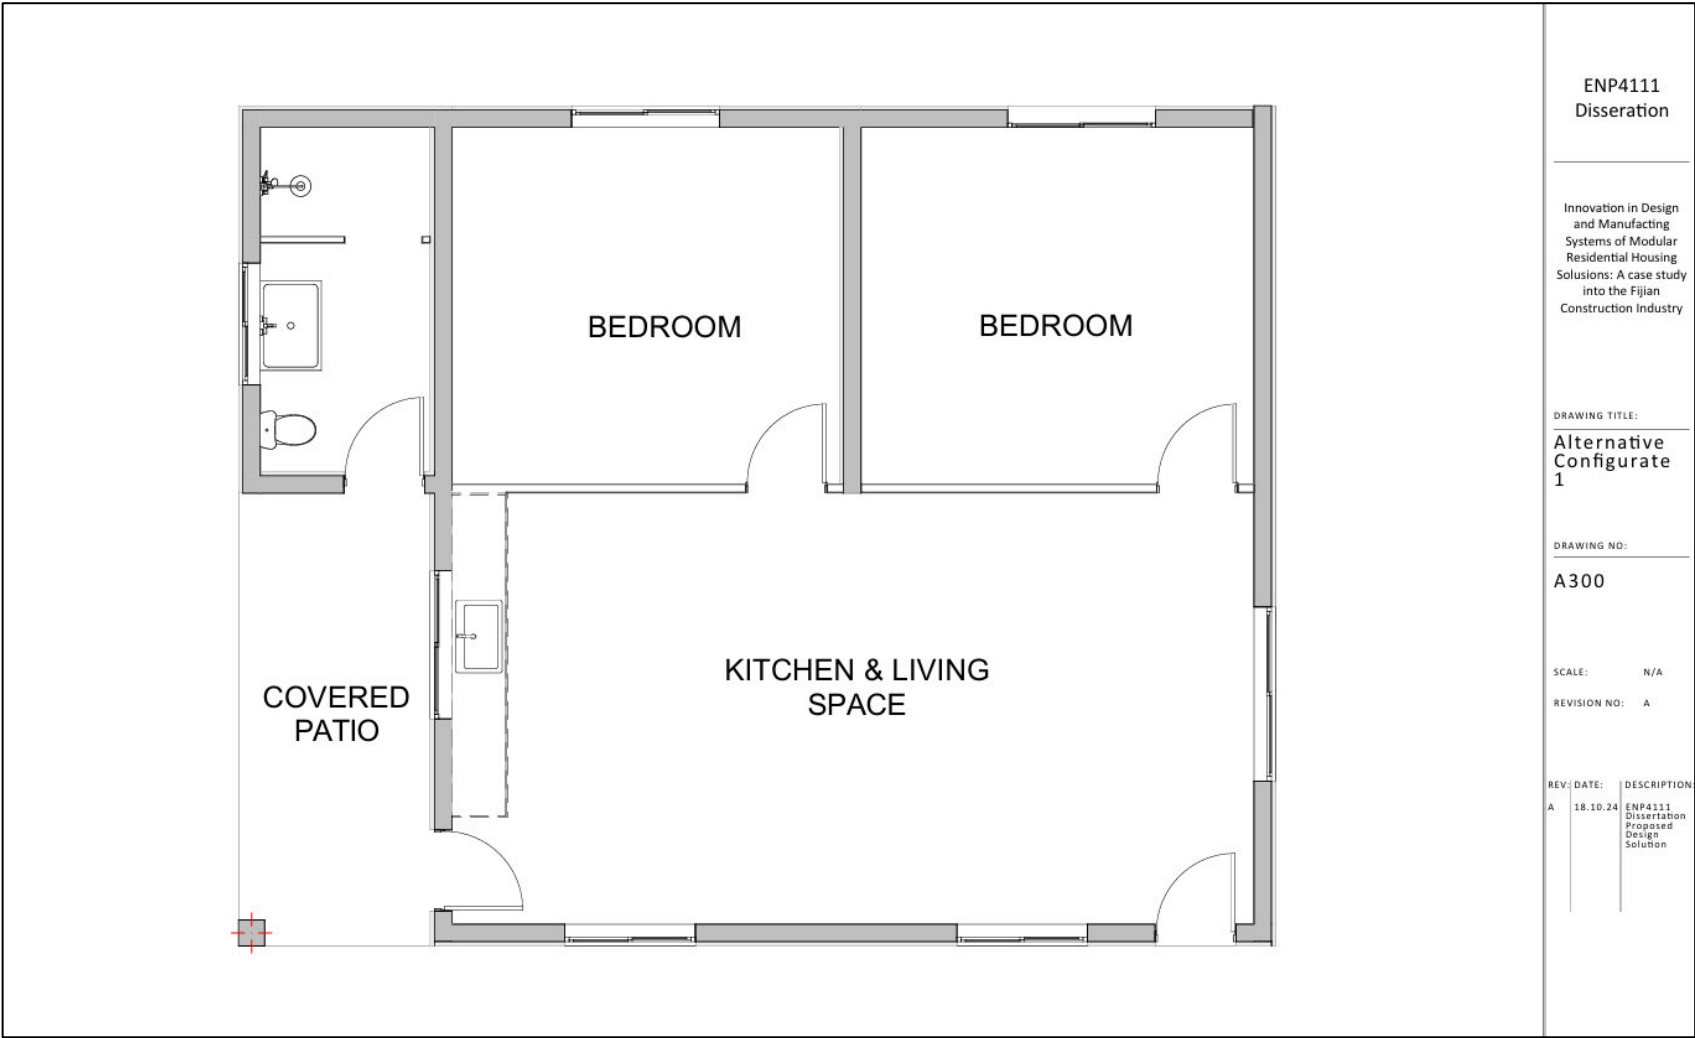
Proposed Modular Construction Alternative Configure 1 (Battersby, 2024)
